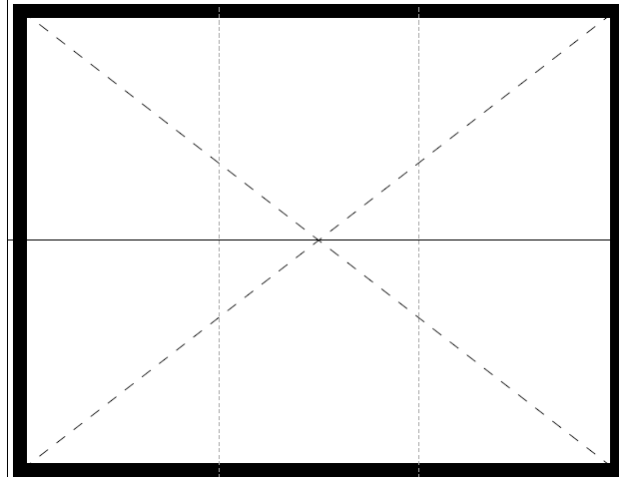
Roof bracing layout, indicated with dashed line (used with permission from Versatile Homes and Buildings)
